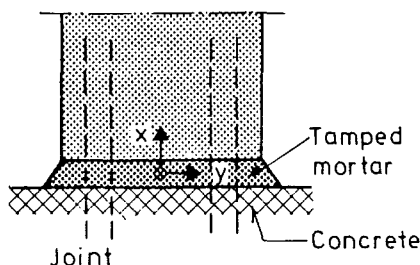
Column-foundation joint (Riberholt, 1986)
